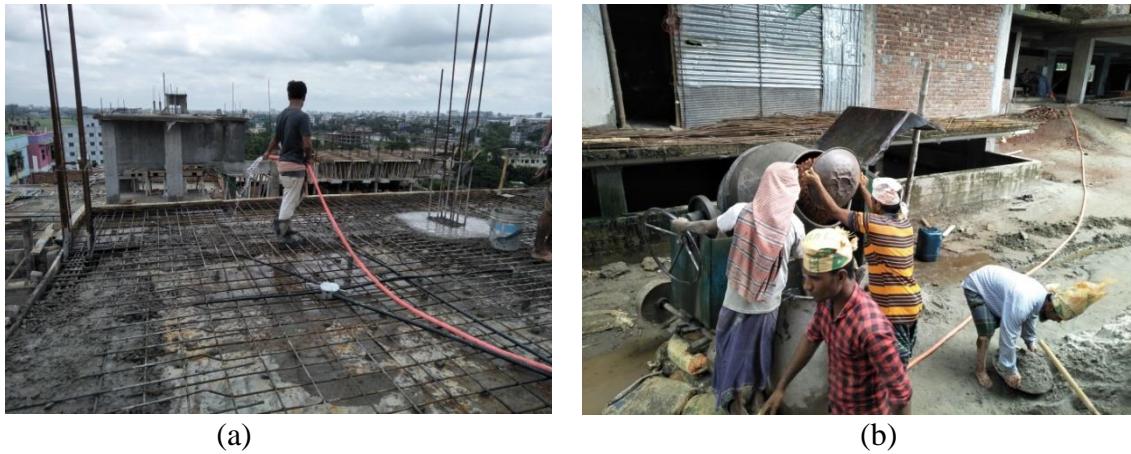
(a) Spreading water before casting (b) Mixing process of concrete
